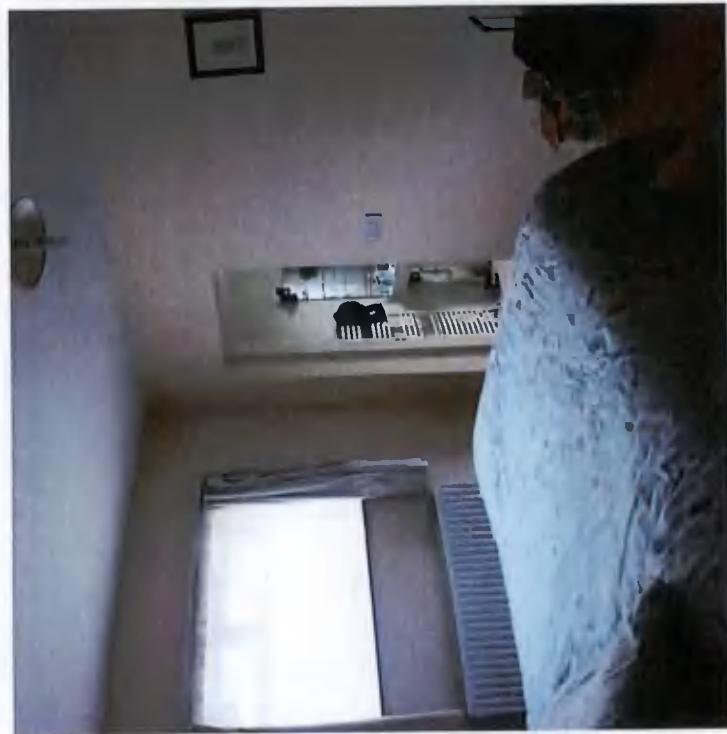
& 11 – North gable third bedroom/ ensuite also accessed from kitchen.
